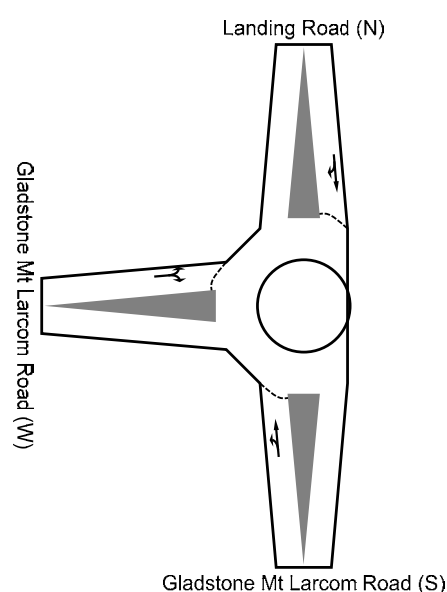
Altered Gladstone-Mt Larcom Road/Landing Road intersection
